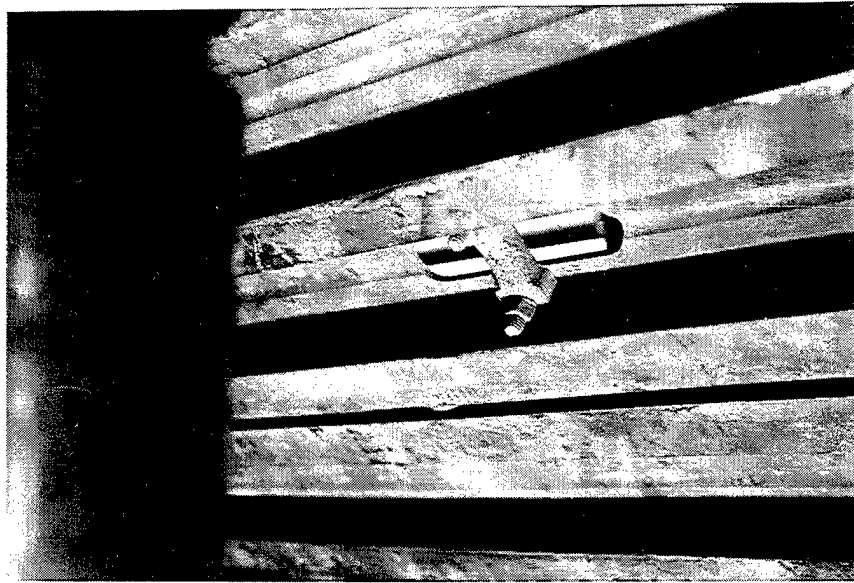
A view of the lifting steel bar underneath the oblong hole in Figure 52.
